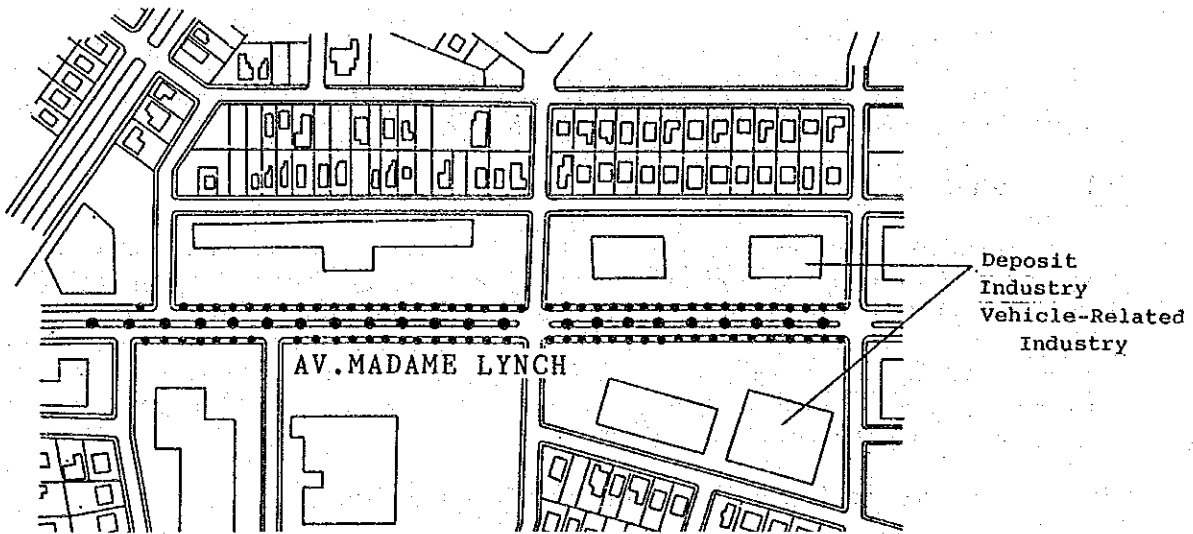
MODEL PLAN OF ACCESS CONTROL(URBAN ARTERIAL TYPE)
